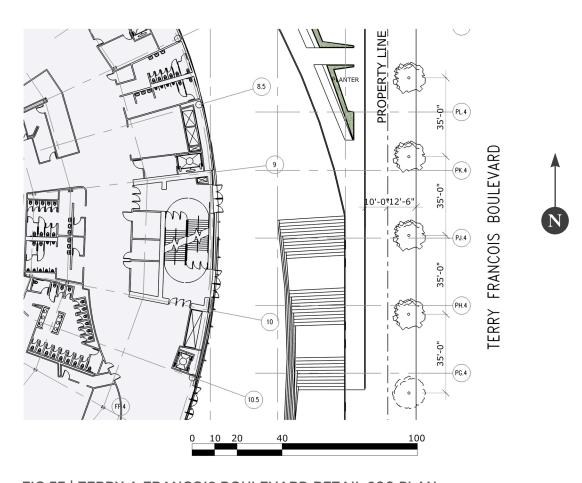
| TERRY A FRANCOIS BOULEVARD RETAIL 200 PLAN
